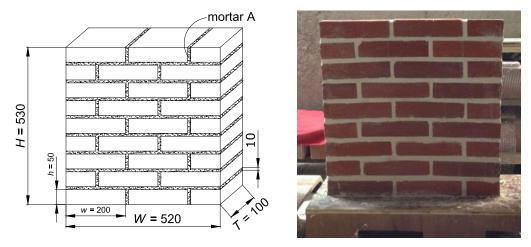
Unreinforced masonry specimens (URM). Sizes in mm.
